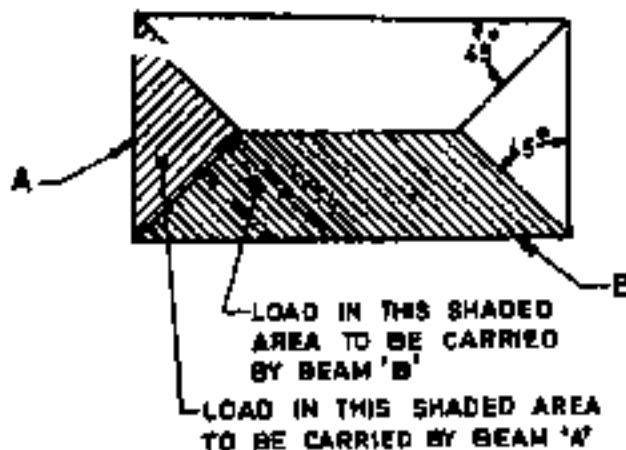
LOAD CARRIED BY SUPPORTING BEAMS
